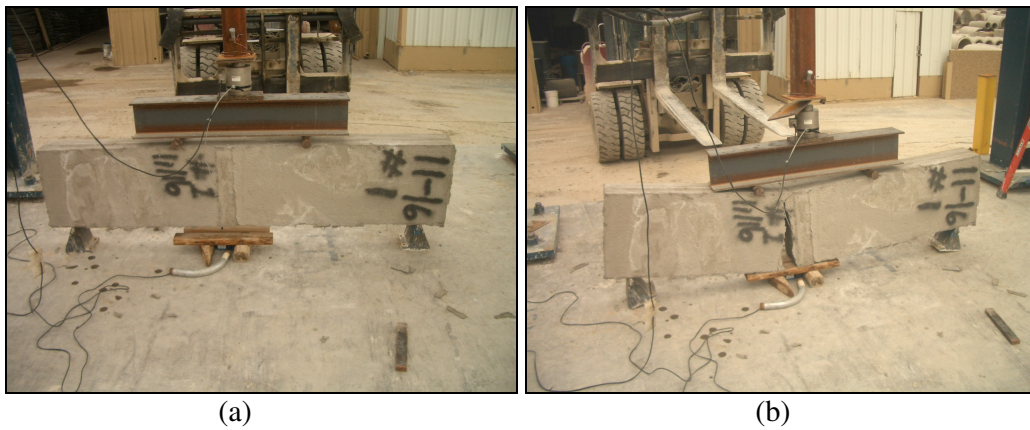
Beam for 1<sup>st</sup> batch concrete cast on 11/16/06 for 14 day test;
